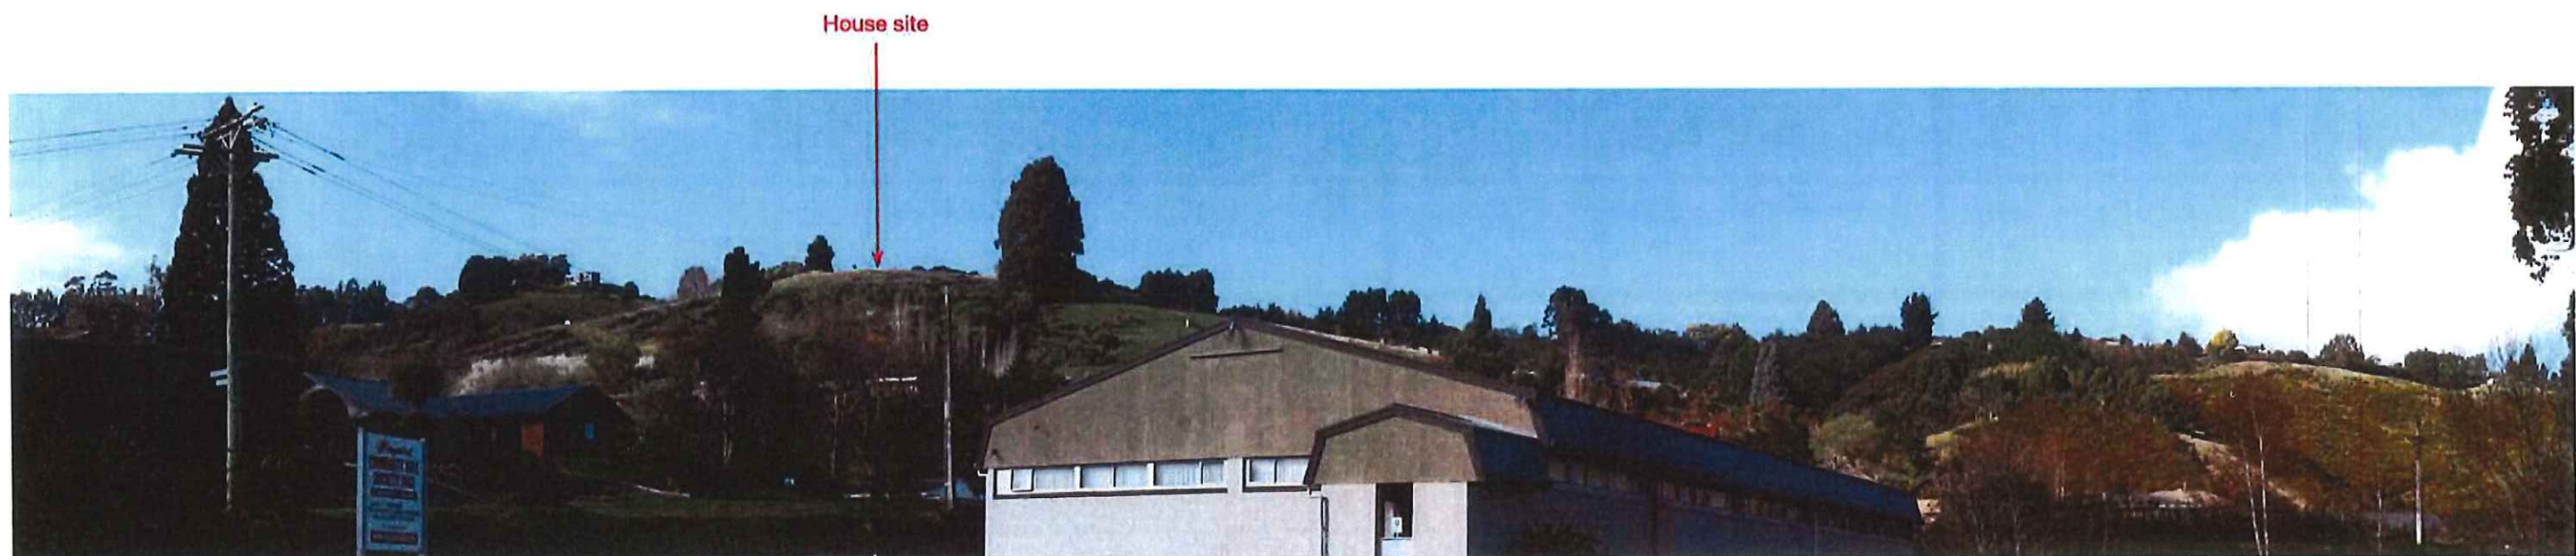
View toward the site from Gladstone Road North, adjacent to Wingatui Hall
